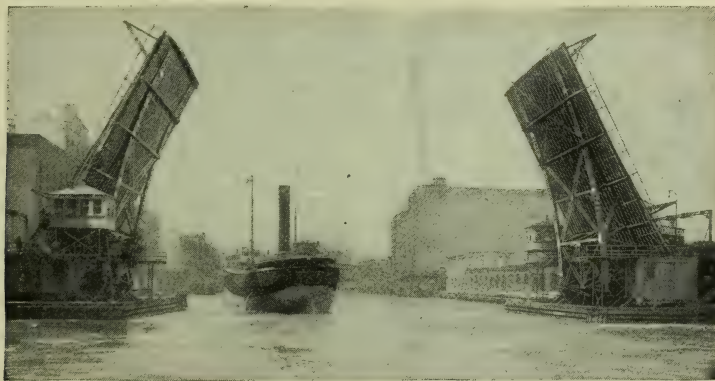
Scherzer Rolling Lift Bridge (Open), Crossing Chicago River
